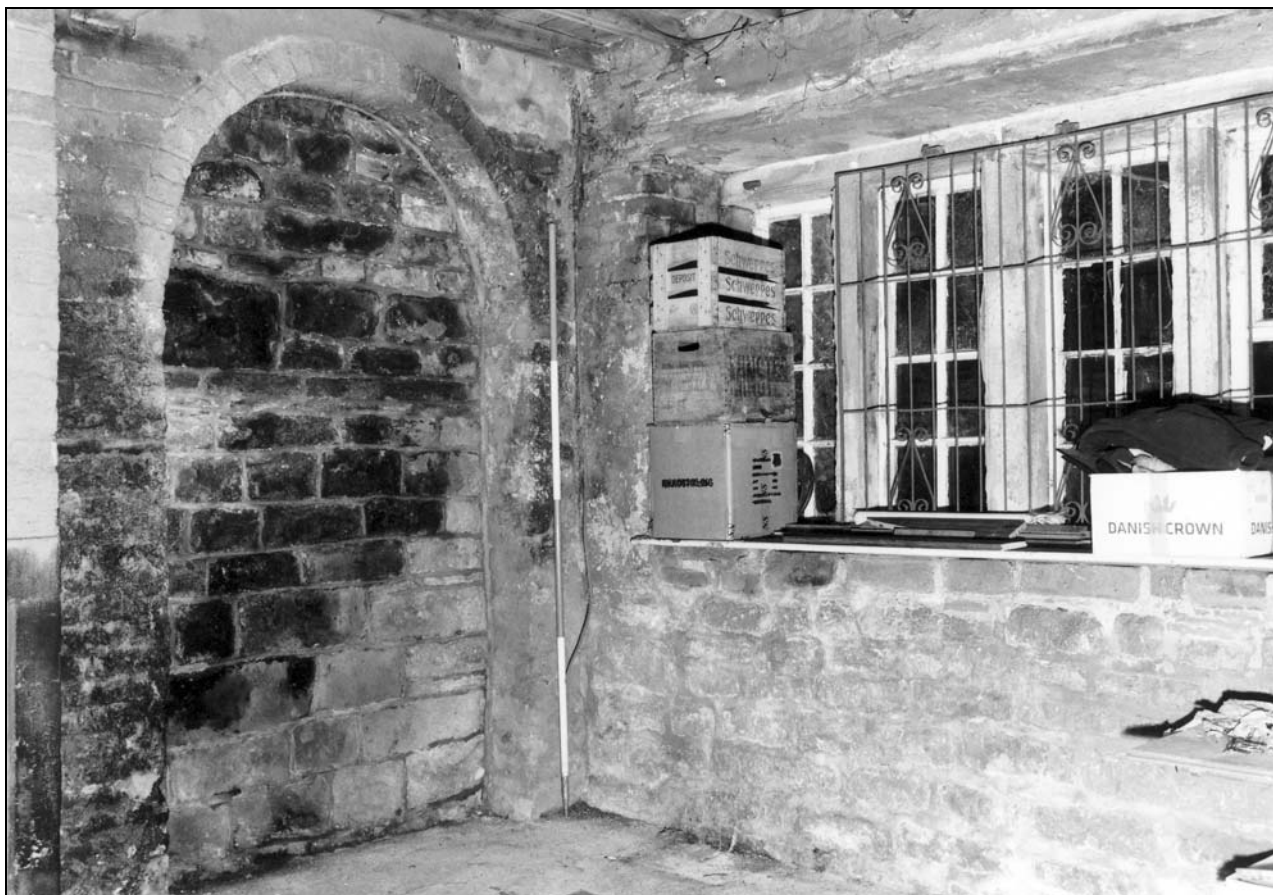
Ground floor of workshop: south-east corner (film 5, frame 7)
